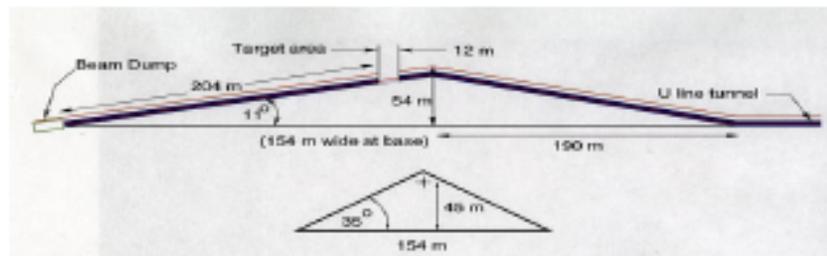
Elevation view of the neutrino beam line to Hornestake, South Dakota.
